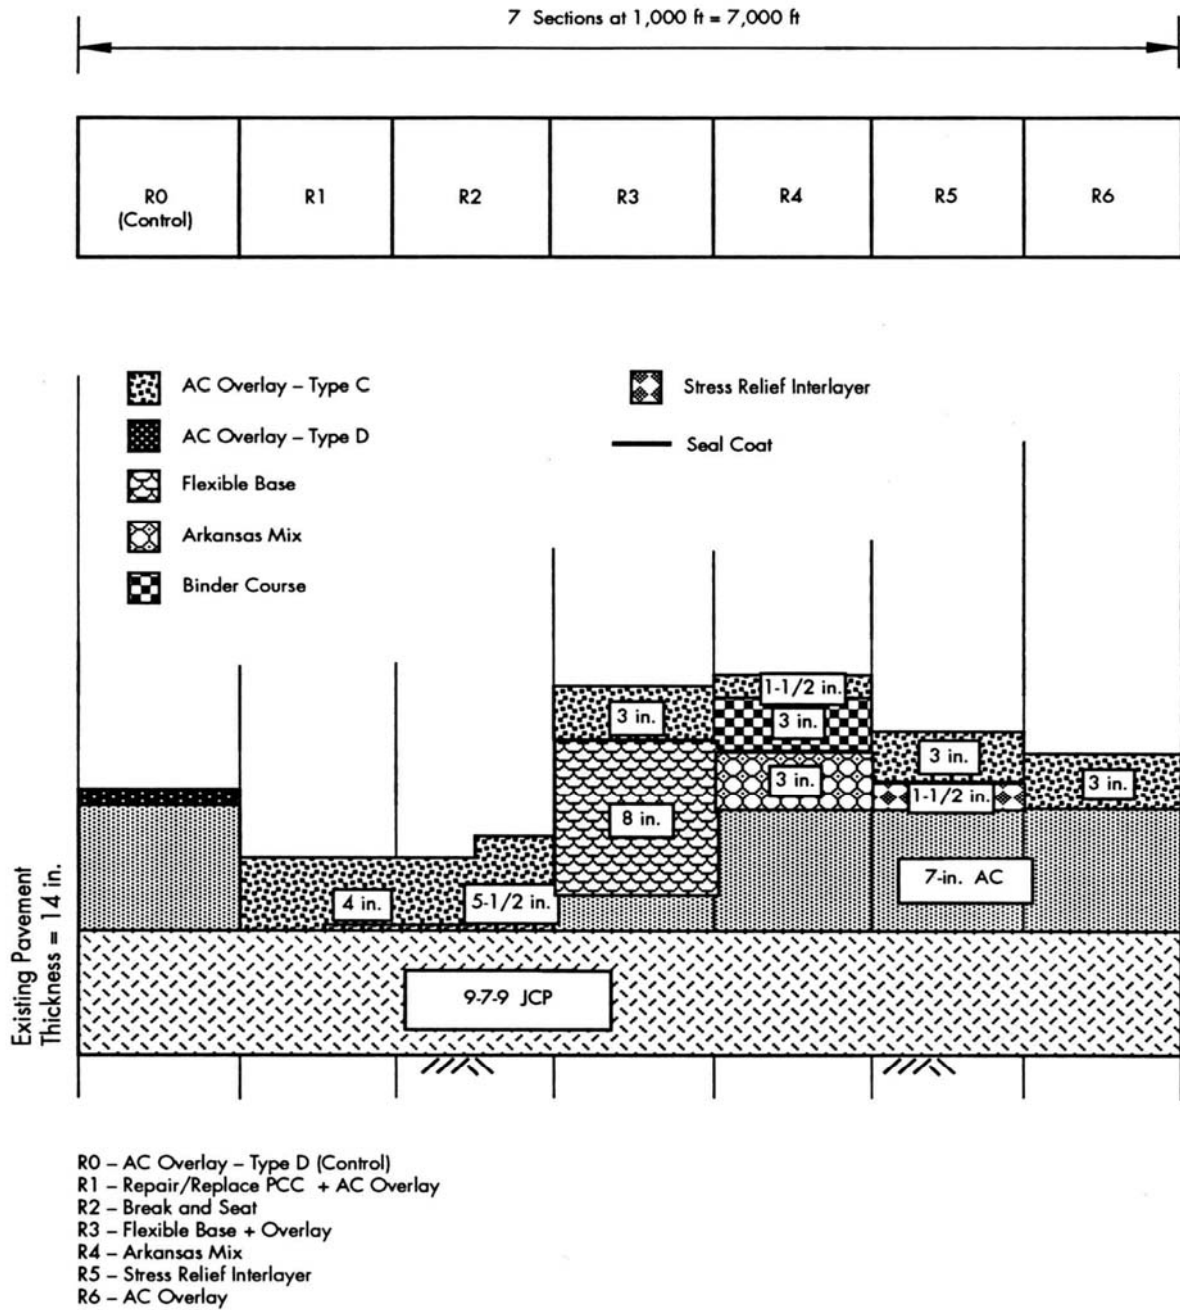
Layout of the JCP Sections on the Lufkin Experiment (2).
